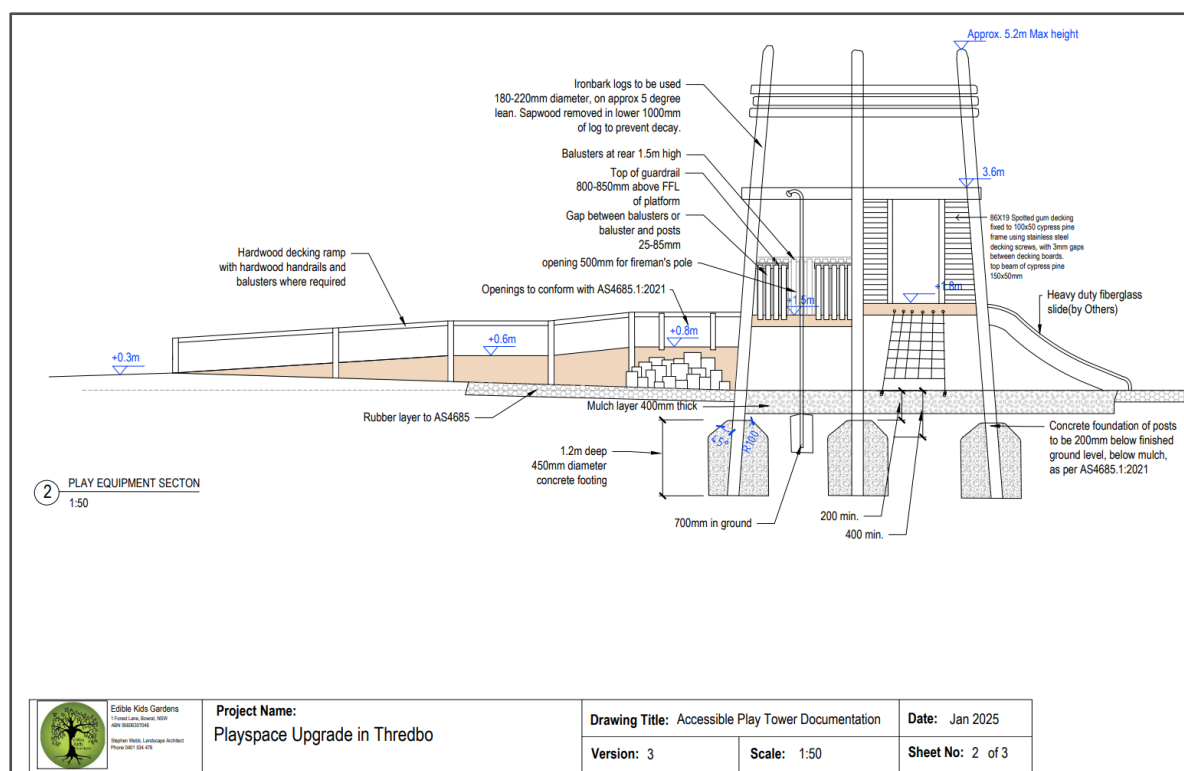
| Proposed Nature Play Playground Design (Source: Applicant's documentation)
